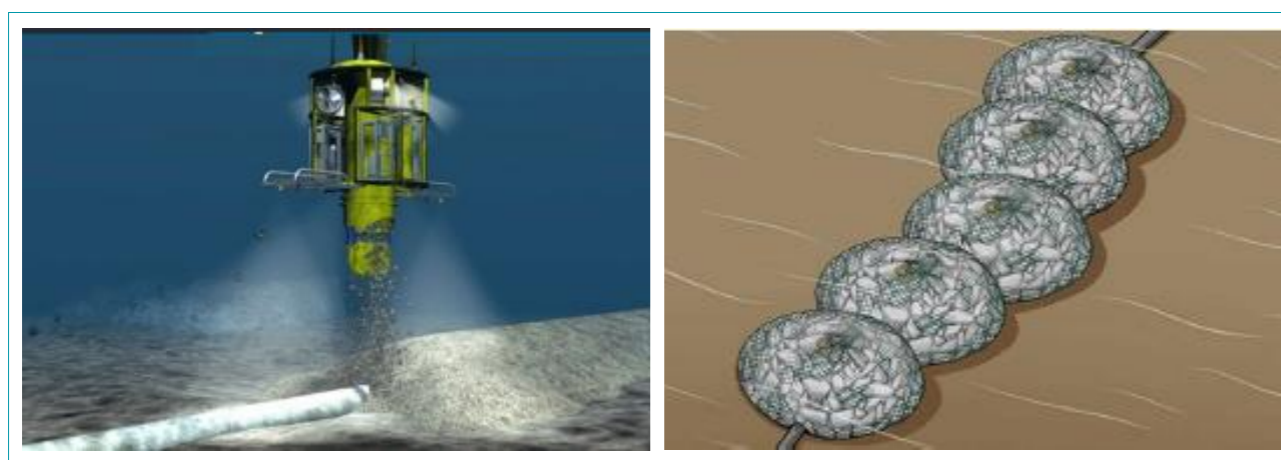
Rock Cable Protection Methods (Left: Rock Placement; Right: Rock Bags)
